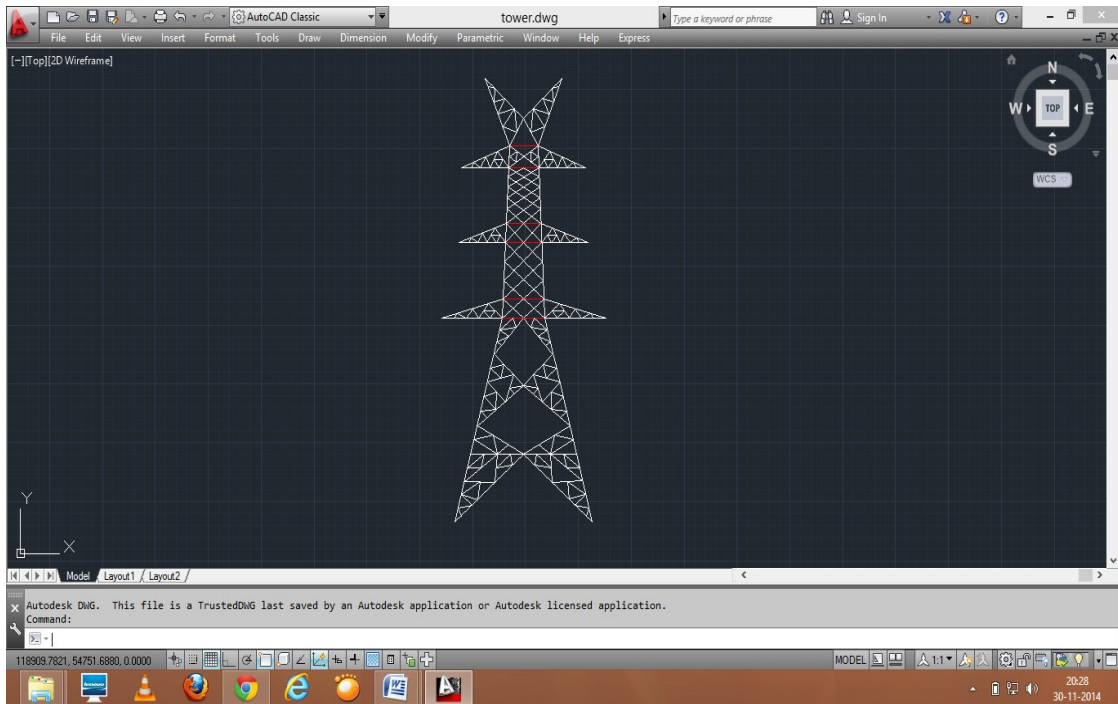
A 2-D structure of tower designed in AutoCAD
